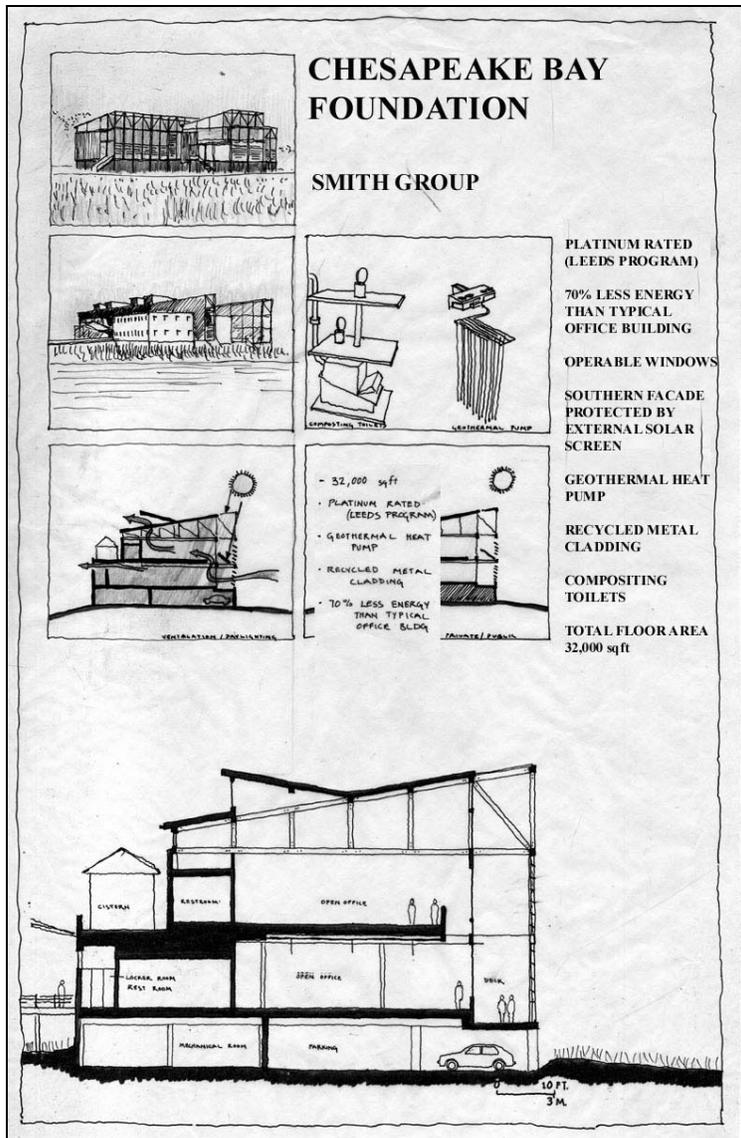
Chesapeake Bay Foundation: Building Precedent Analysis
